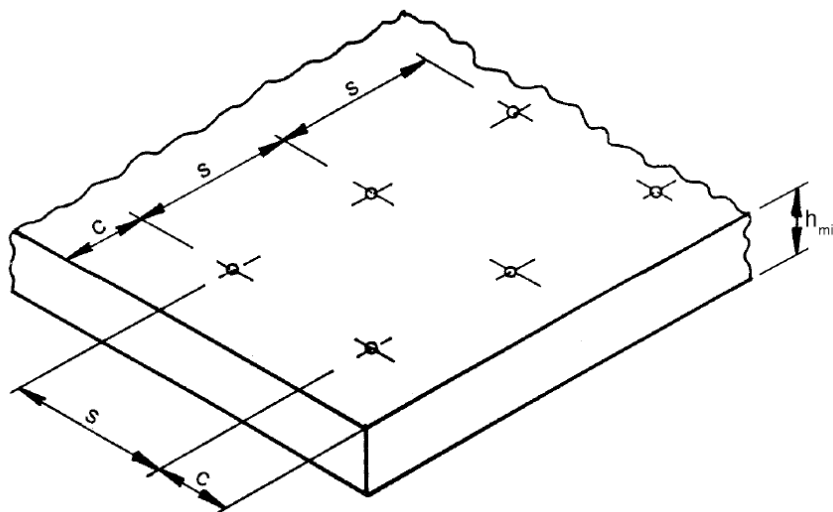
Spacing of TT-THROUGH BOLT fasteners in base material
